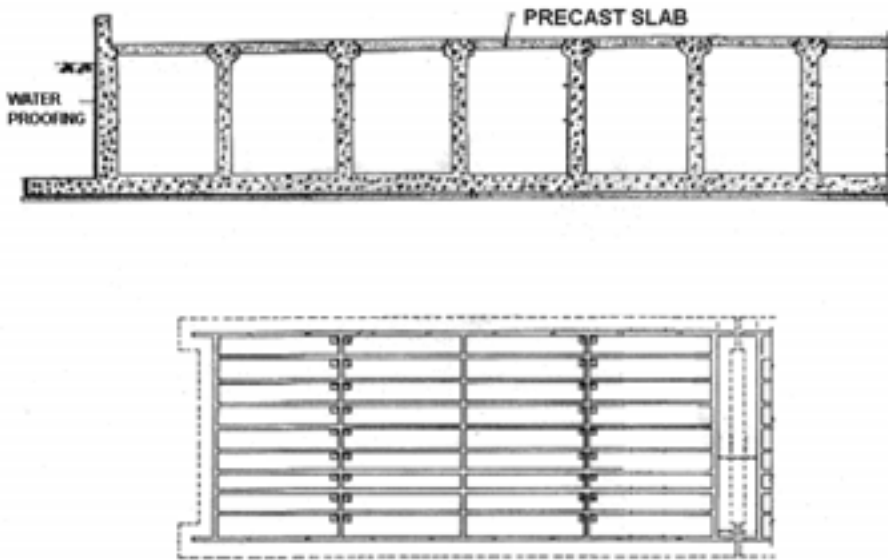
Layout and plan (one battery) of reinforced concrete trenches.
